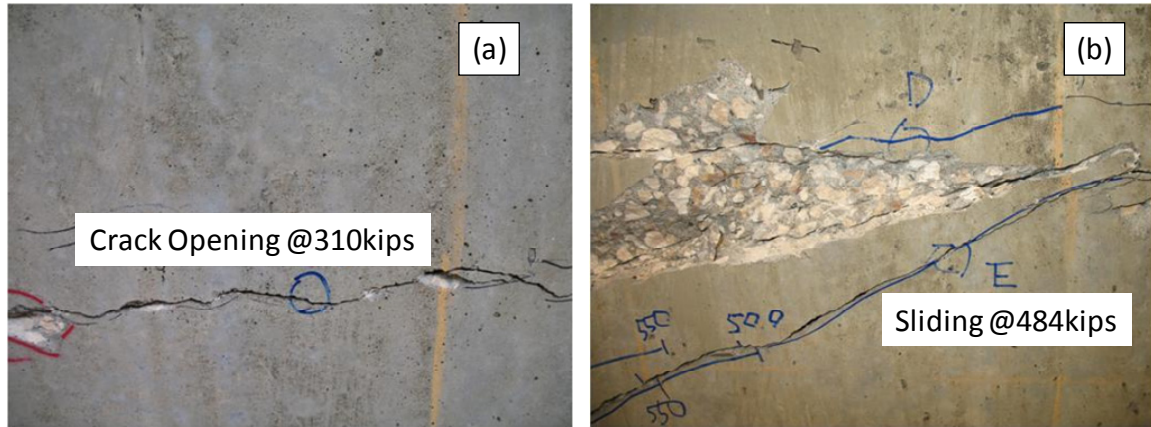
(a) Horizontal crack in the southwest side (b) Crack sliding in the west side
